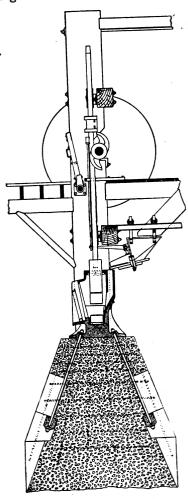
Details of stamp-mill on concrete foundation. 12
